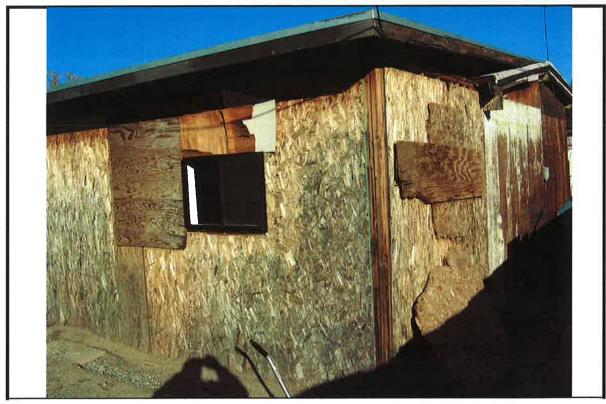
DATE:_TAKEN BY:_ #_NOTES: plywood walls N.O.D. # 13
